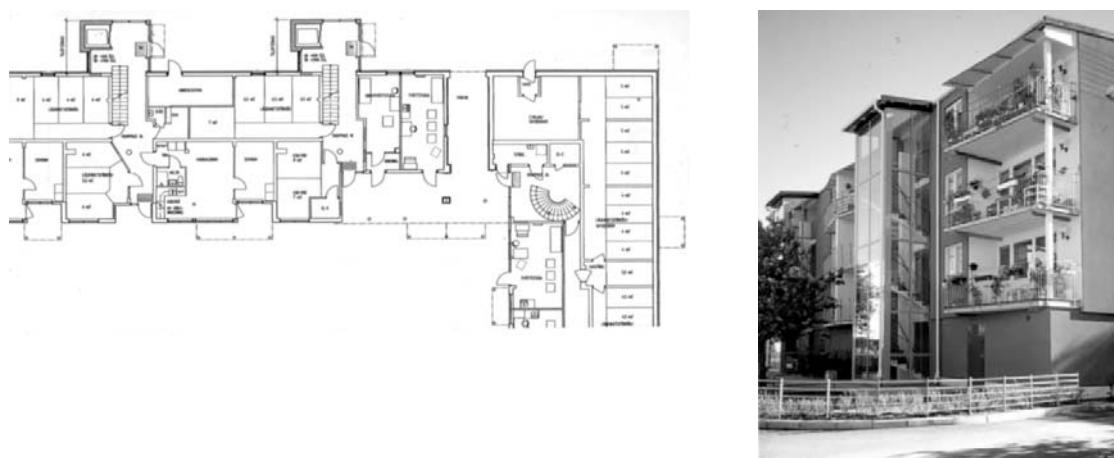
Entrance floor after installation of lift in extended staircases (left). The additions of the new
